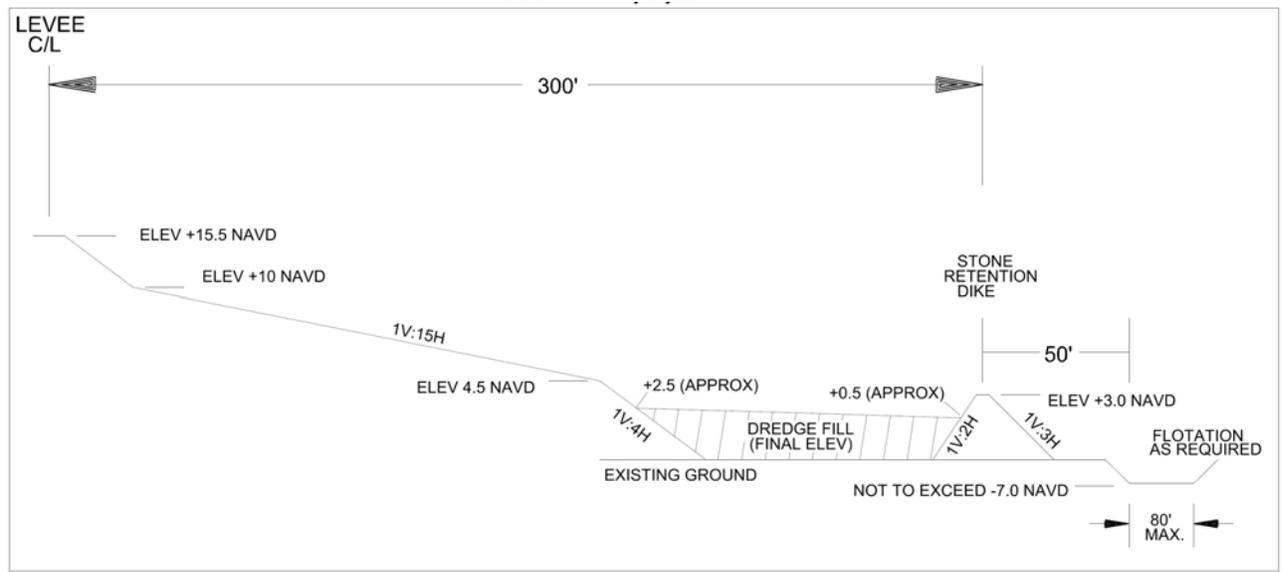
Alternative 3 – 300 ft wave berm and rock dike cross-section.
